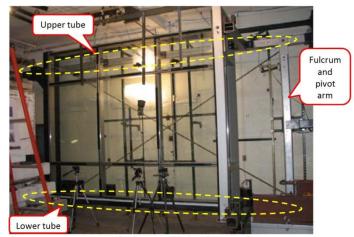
Typical Mockup Mounted on the Racking Test Facility
